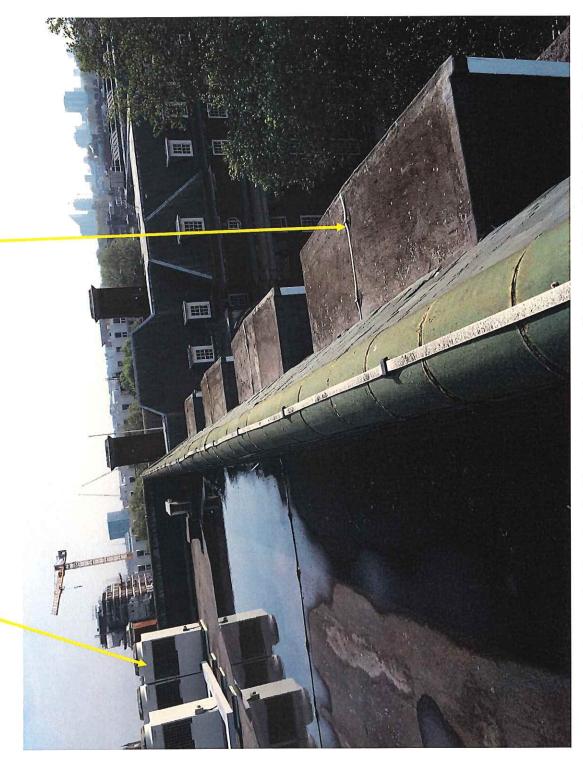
Photo E - Front of Building Overlooking Tavistock Square with Mansard Office Windows & Existing AC Condensers
